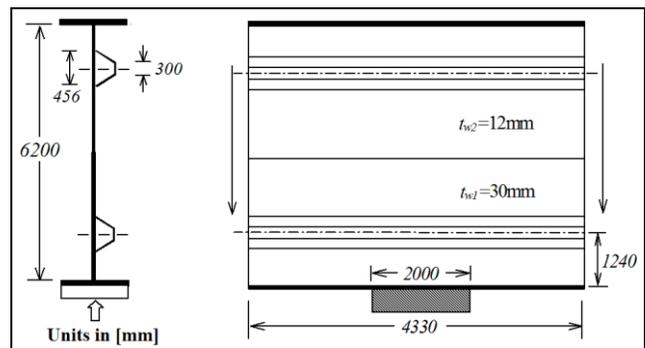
Part of bridge girder studied by Dauner et al. (2000)
